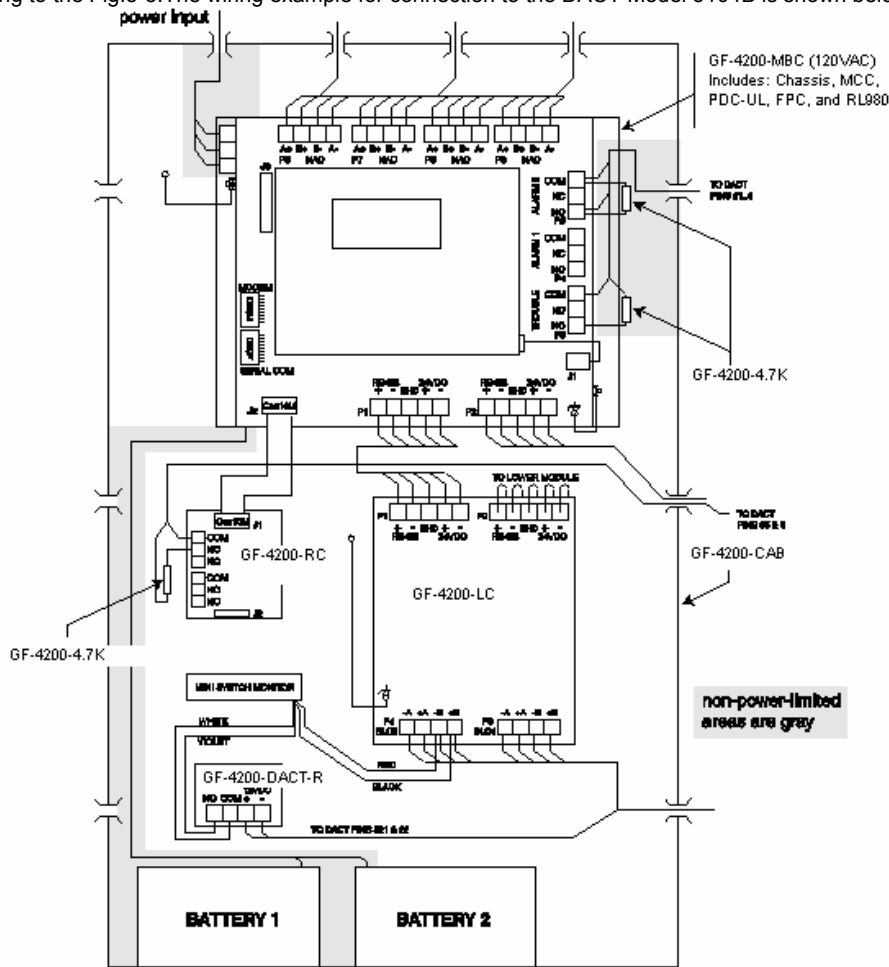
Wiring example for DACT Model 5104B connection to the GF-4200
